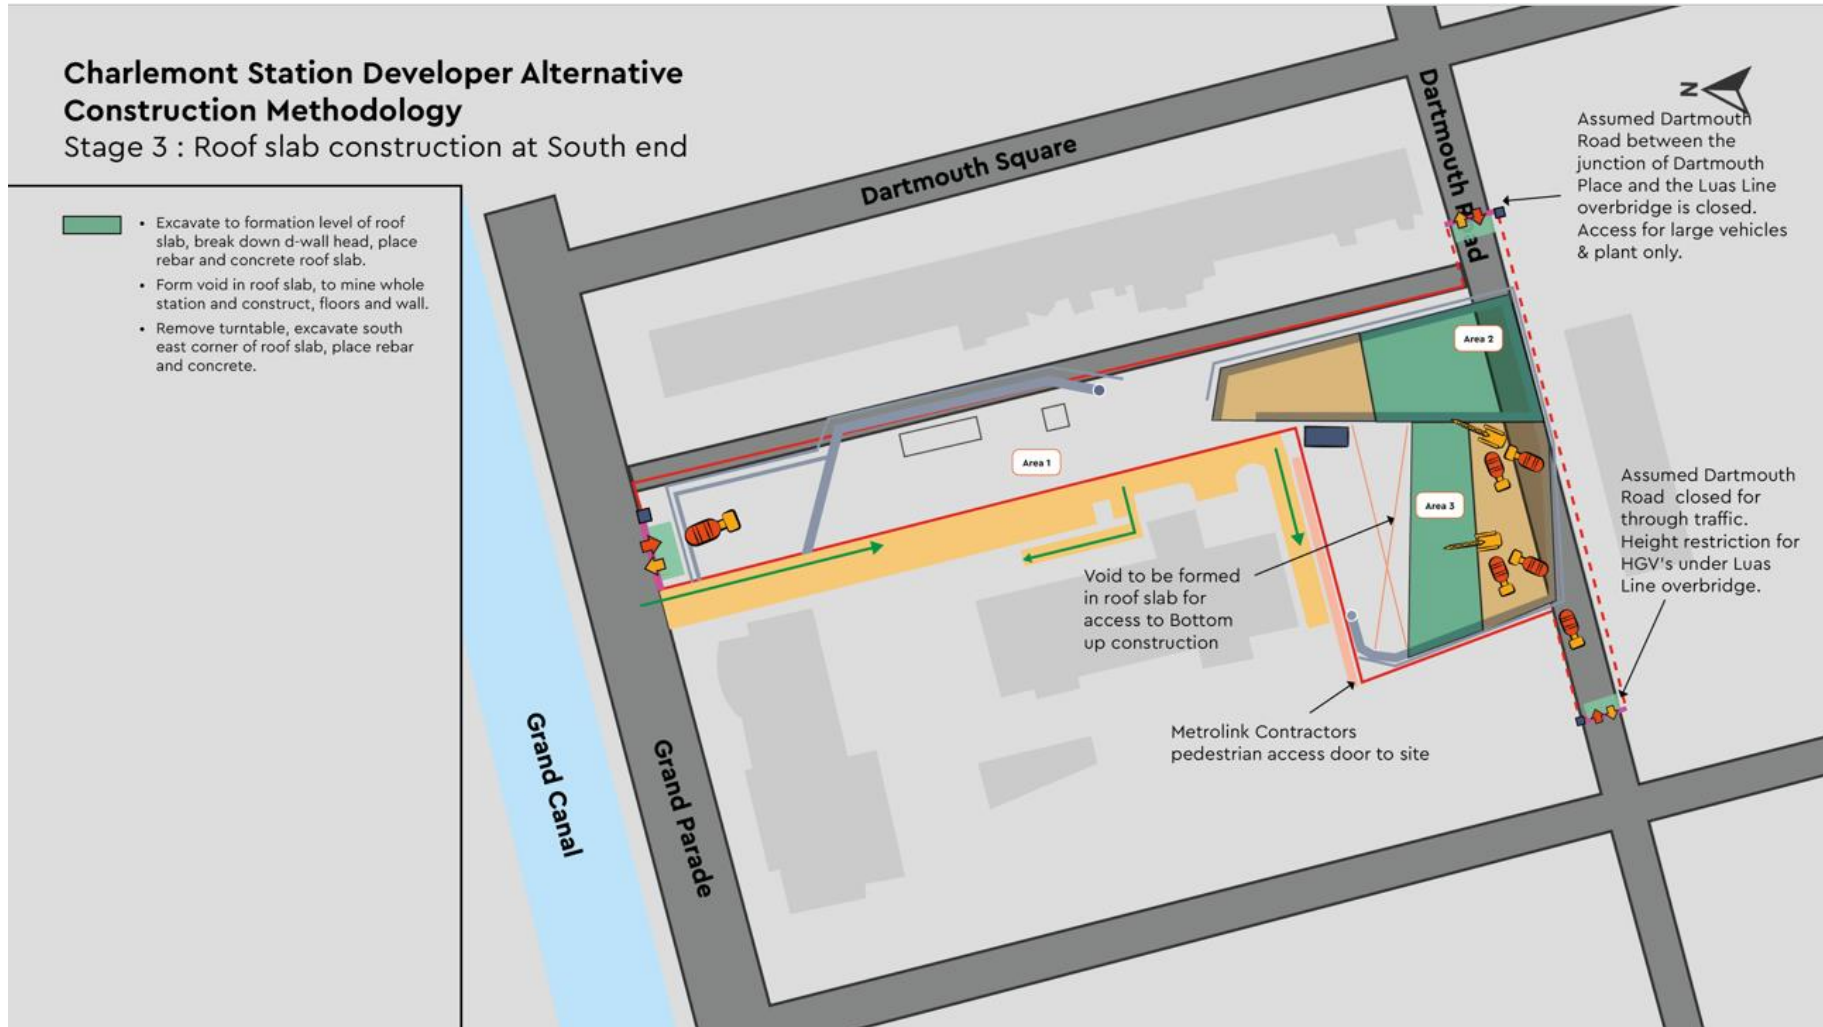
Charlemont Station – Stage 3 – roof slab construction at South end
